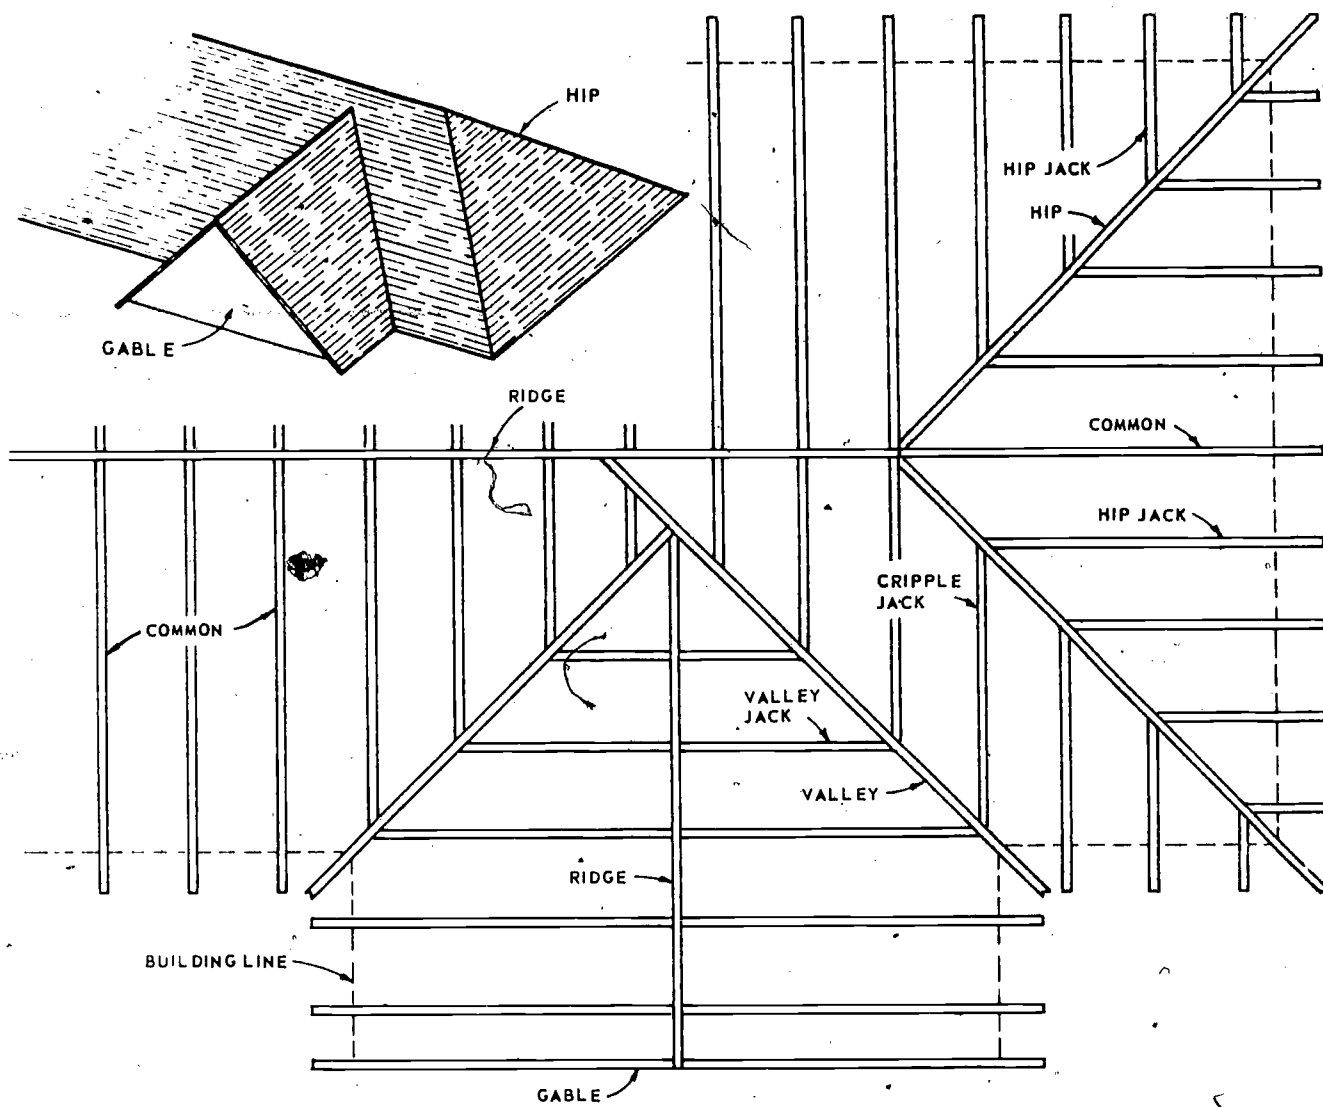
Plan (top) view of a roof frame, showing ridges and various kinds of rafters. Inset shows how roof will appear when finished.
